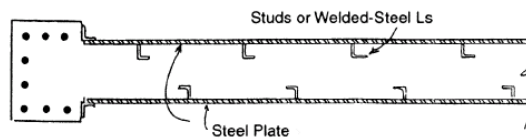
Concrete filled composite shear wall with two steel plates.
